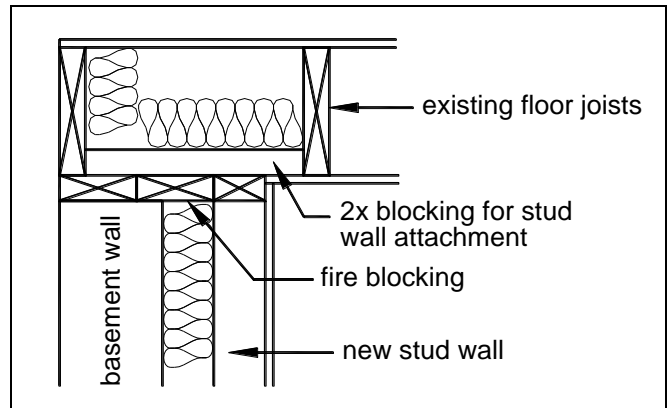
FIRE BLOCKING AT OFFSET STUD WALL
